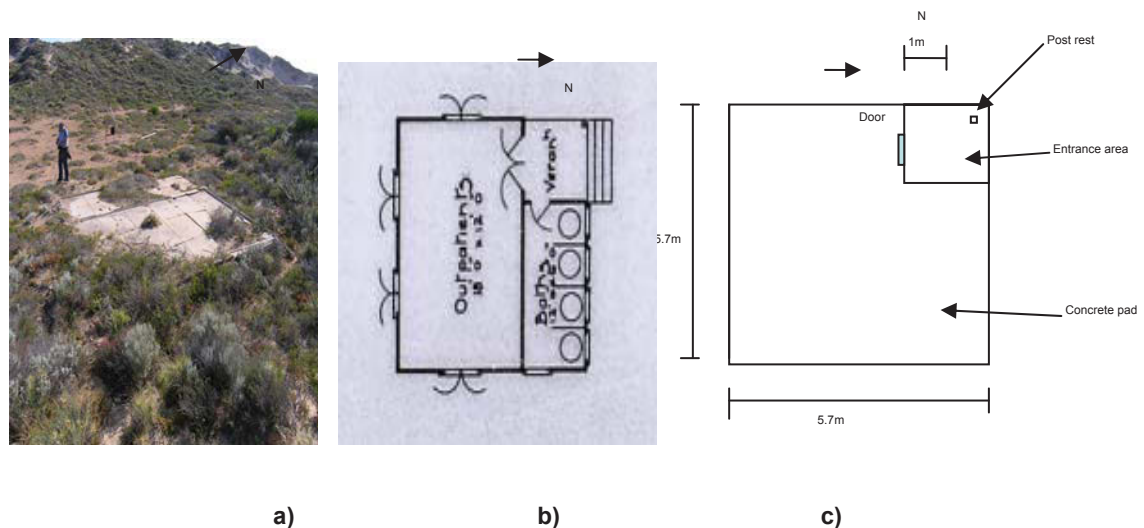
a) Photograph, b) architectural plans (State Records Office, Cons 1647 P.W.D WA15024) and c) archaeological drawings on the outpatients building on Dorre Island.
